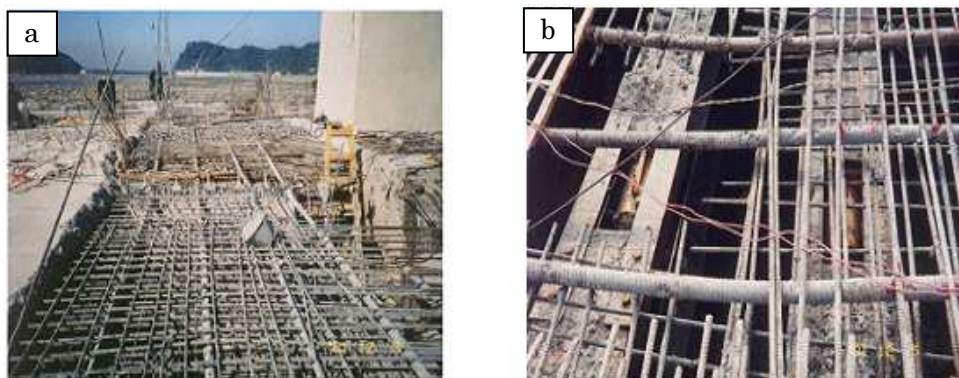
Repair of the girder near the pylon: (a) new rebar mesh, (b) hydraulic jacks inside the girder to balance the compressive force
